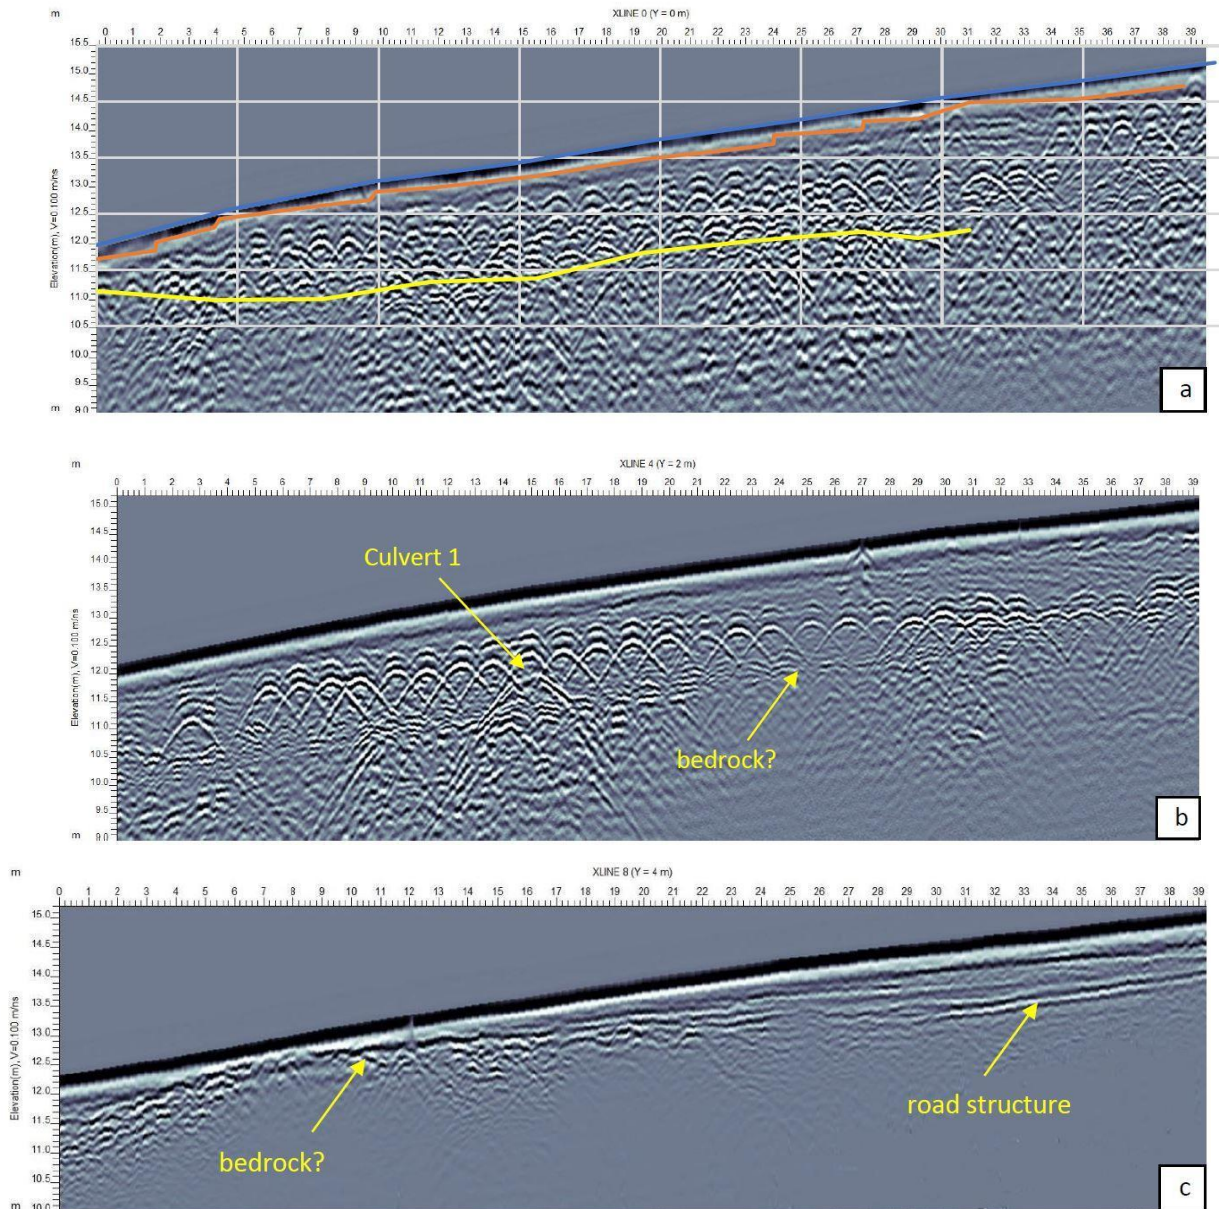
Selected GPR Xline profiles from Survey 4, along the first ~40 m of Northside Road adjacent to the wooden retaining wall. a) Xline 0, ~1.1 m from the retaining wall. Measurements of wall top (orange line) and bottom (yellow line) are superimposed. b) Xline 4, ~3.1 m from the retaining wall. c) Xline 8, ~5.5 m from retaining wall. Vertical exaggeration 2X.
